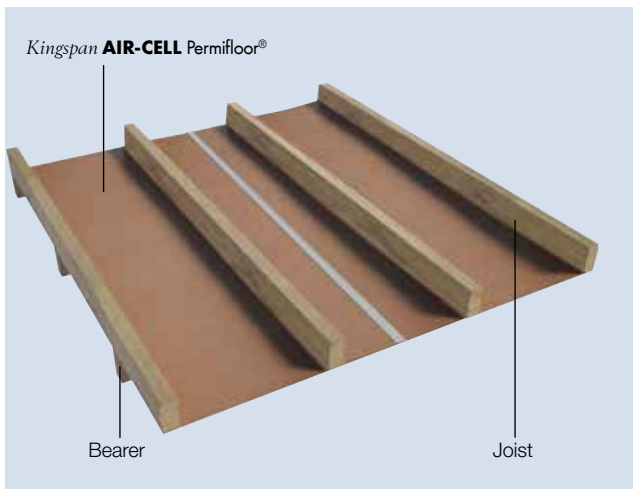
Kingspan AIR-CELL Permifloor® installed over bearers
